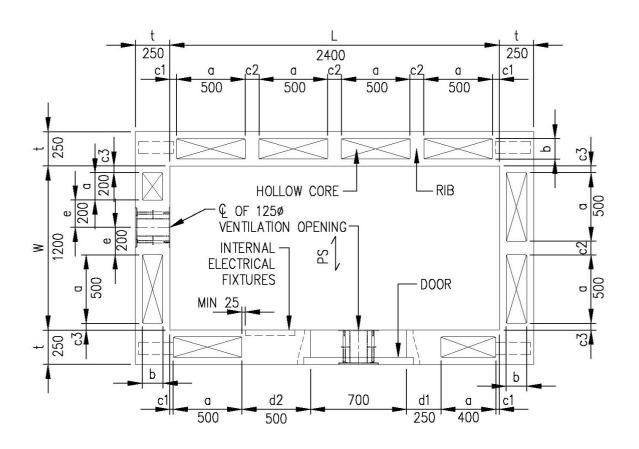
(c) PRECAST HS DIMENSIONS
